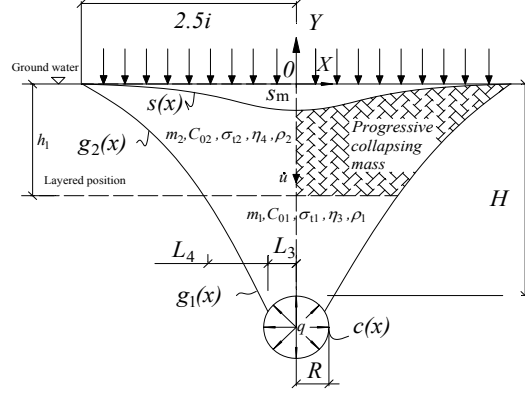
Curved failure mechanism of shallow tunnels buried in the layered soils
